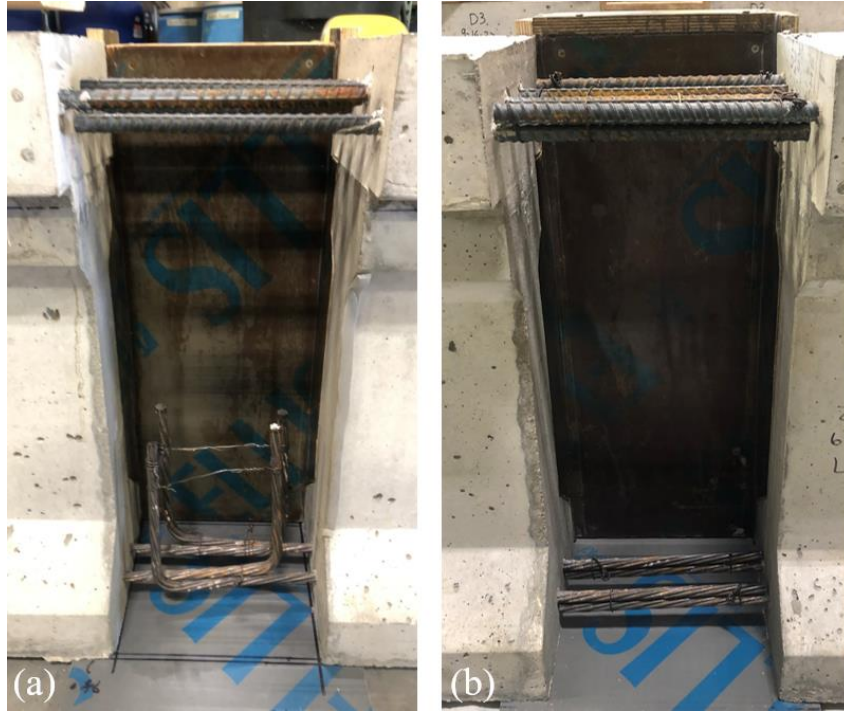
Joint reinforcement for hooked strand (a) and straight strand (b) designs
